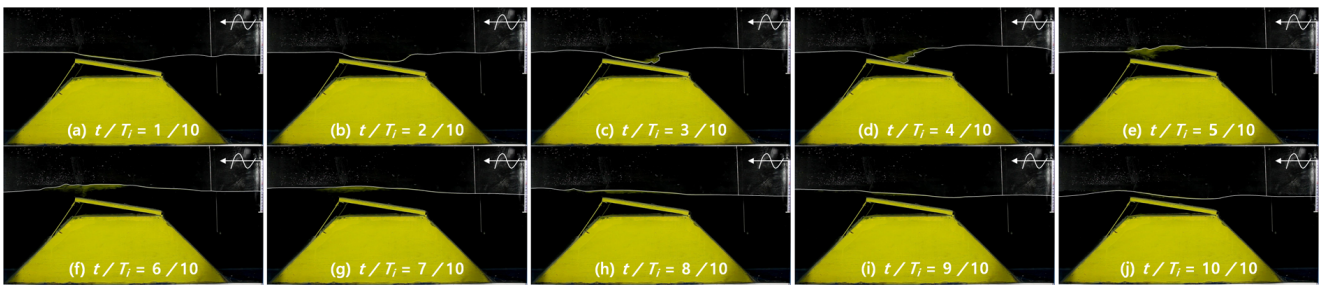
Temporal and spatial distributions of surface elevations around tide-adapting submerged breakwater in Run-12 ($h=32\text{ cm}$)
